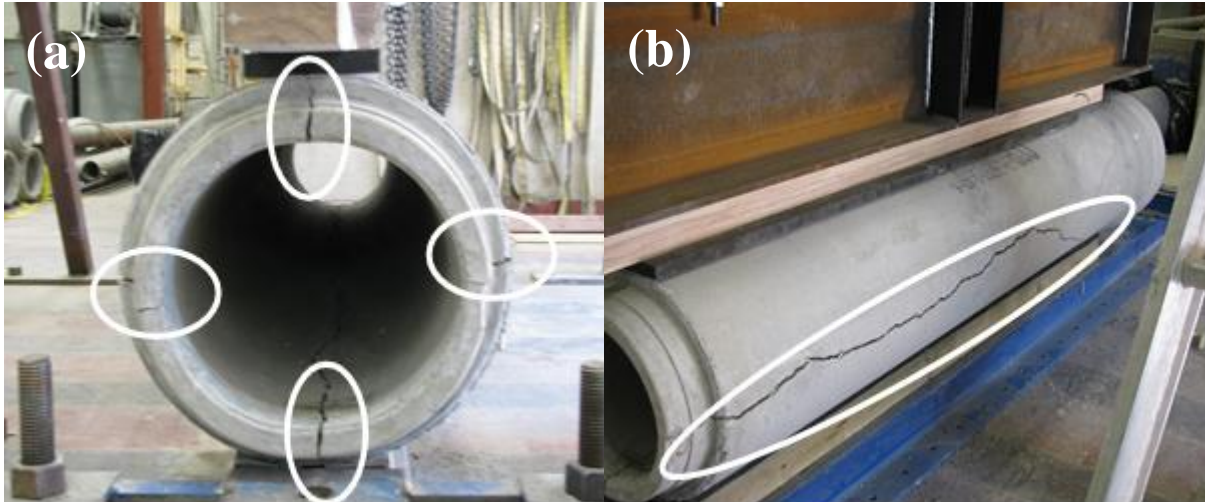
Flexural failure mechanism: (a) cross-sectional cracks, and (b) longitudinal cracks.
